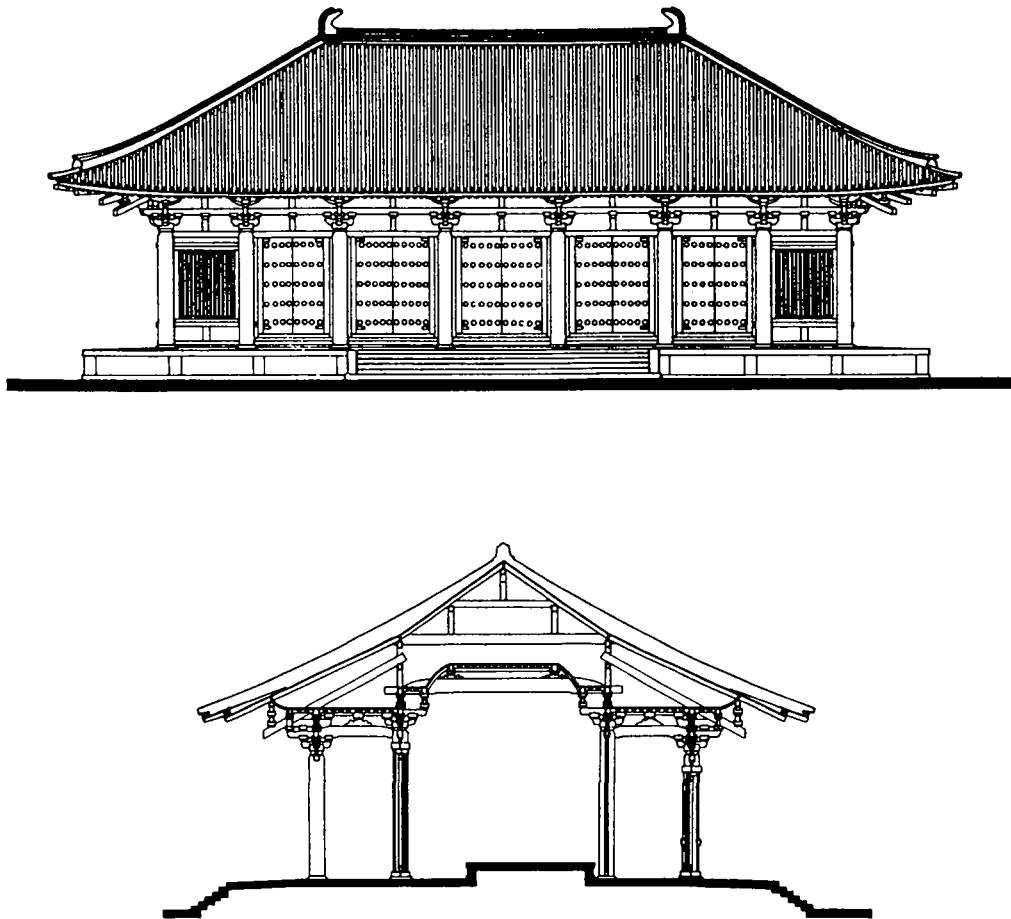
Reconstructed front elevation and reconstructed section of the image hall of Tōshōdai-ji 唐招提寺とうしょうだいじ 당초제사 in Nara 奈良なら 나라 (759 AD, scale: 1 : 300) (after: BIZALION (1987), pp. 55f.)
